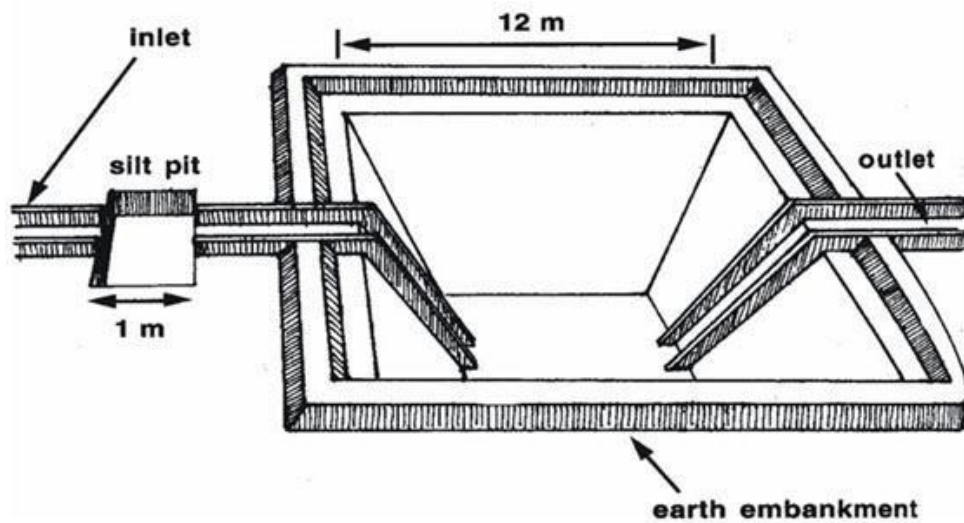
Illustration of Dugout Pond. (Source: Barron and Salas, 2009)
